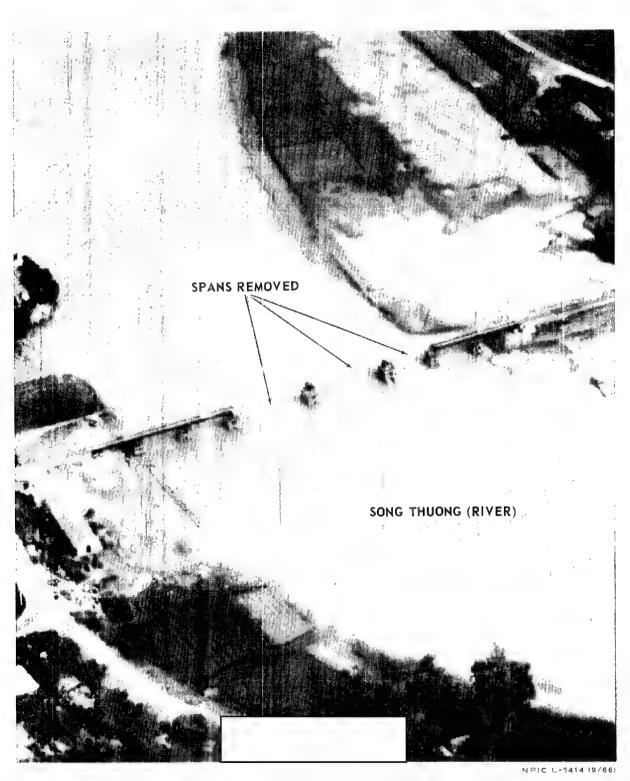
BAC GIANG RAILROAD BY-PASS BRIDGE, HA NOI/PING-HSIANG RAIL LINE, NORTH VIETNAM
